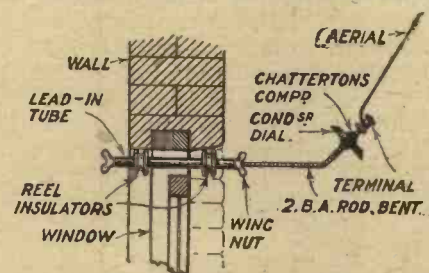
Details of the suggested method of arranging the lead-in may be gathered from this sketch.
